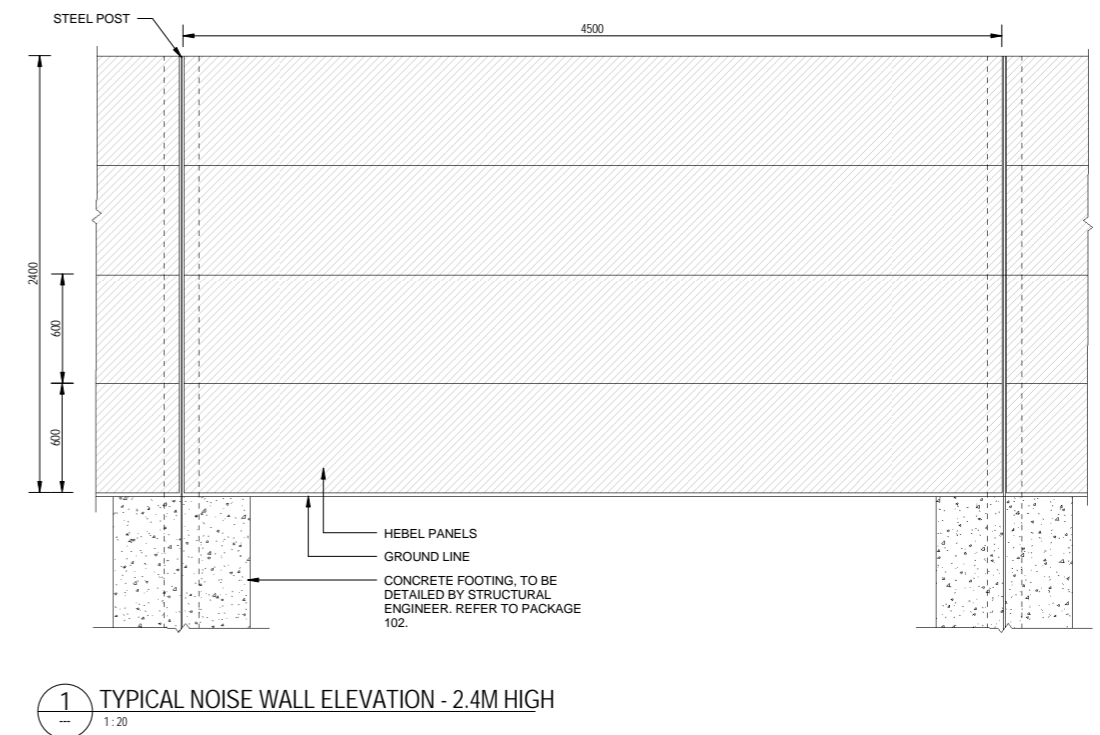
Typical Noise Wall Elevation. Source: HASSELL
